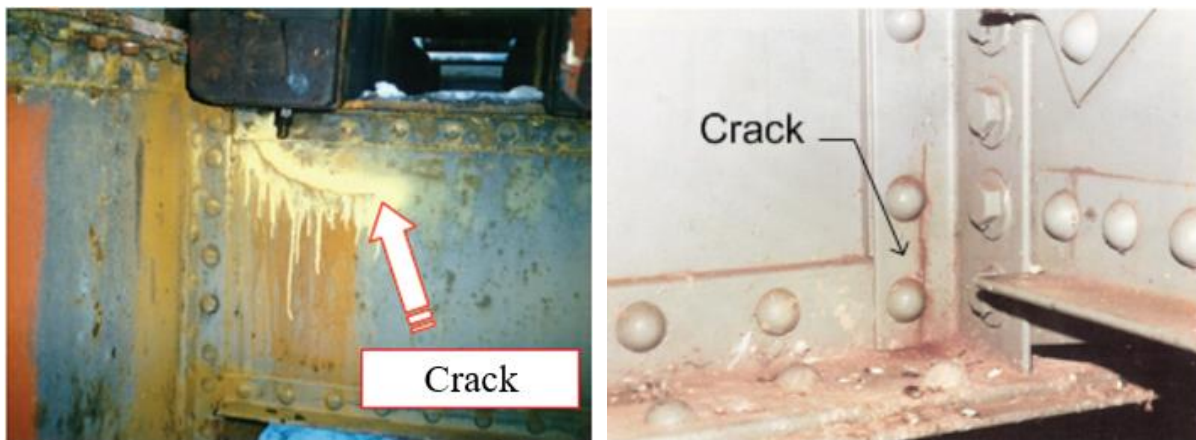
Examples of fatigue cracks on riveted steel bridges - Left: Fatigue crack in the riveted connection of stringer to crossbeam [62], Right: Fatigue crack in the riveted connection of cross-bracing element [63]
